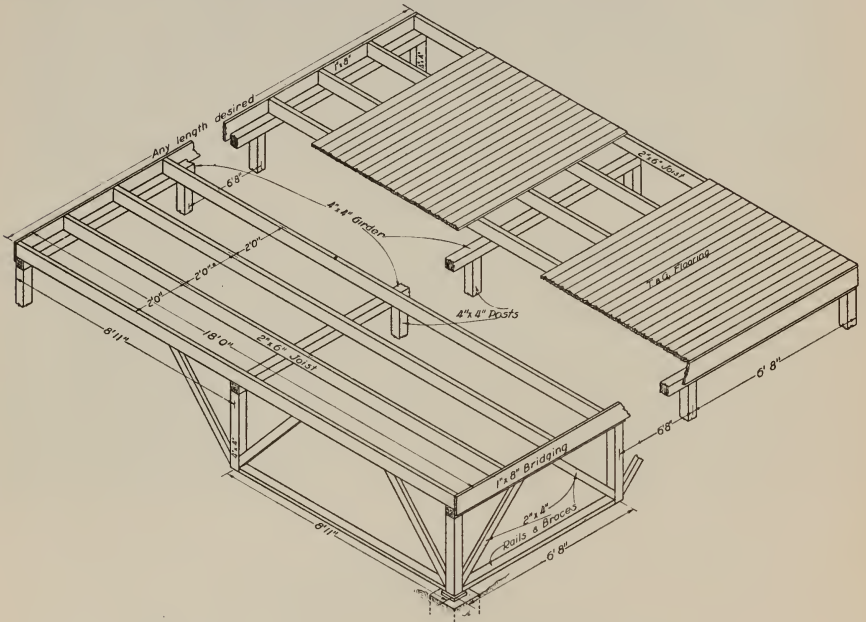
This method of constructing foundation and floor is used where the ground slopes so much that a concrete foundation and floor would be too costly.
